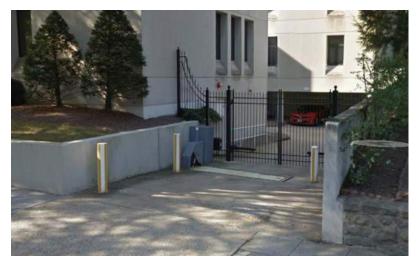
Existing swing arm gate and garage driveway
